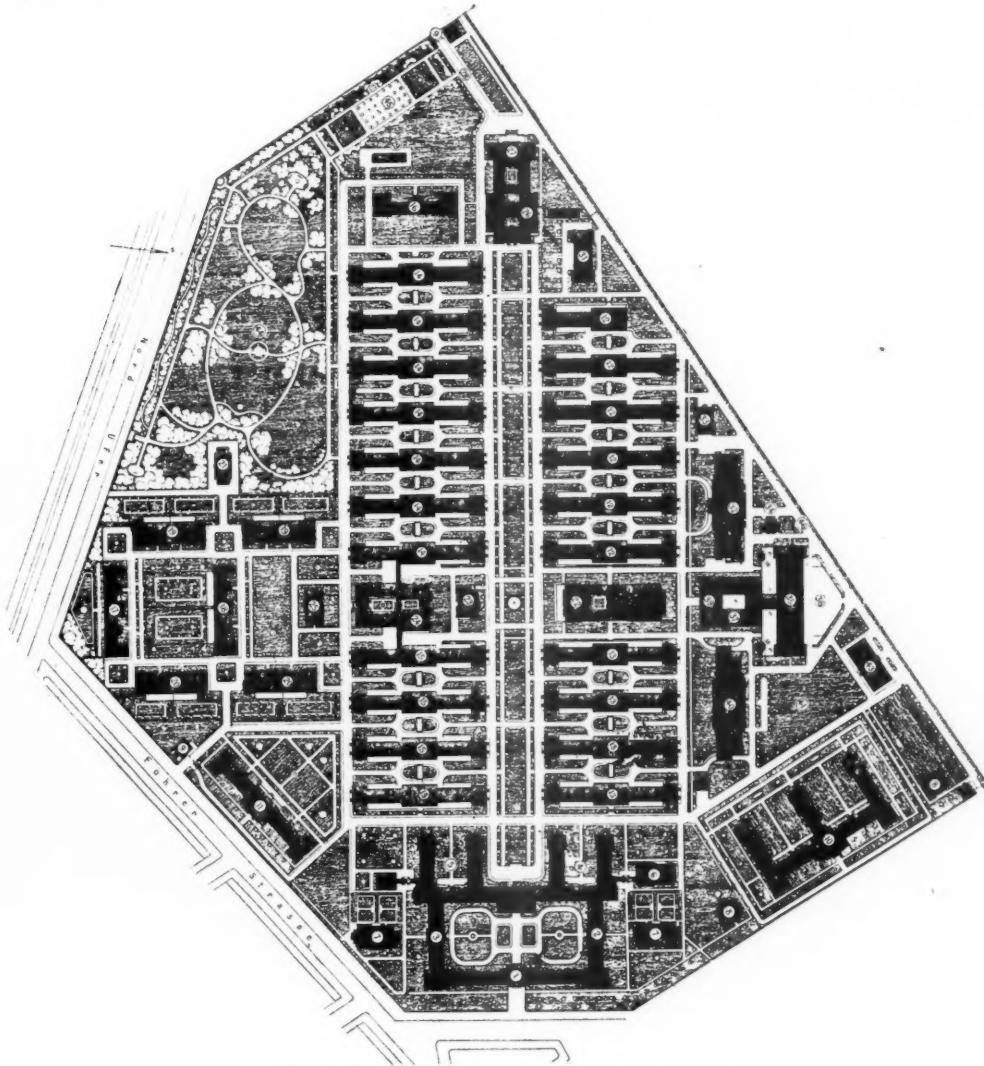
BLOCK PLAN OF THE VIRCHOW HOSPITAL, BERLIN.
